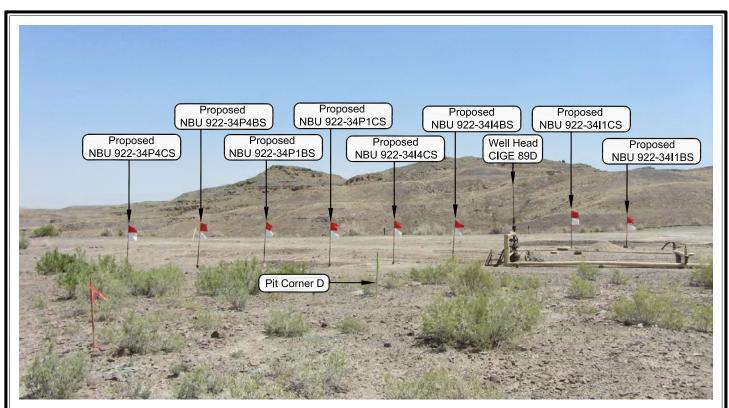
PHOTO VIEW: FROM PIT CORNER D TO LOCATION STAKE
